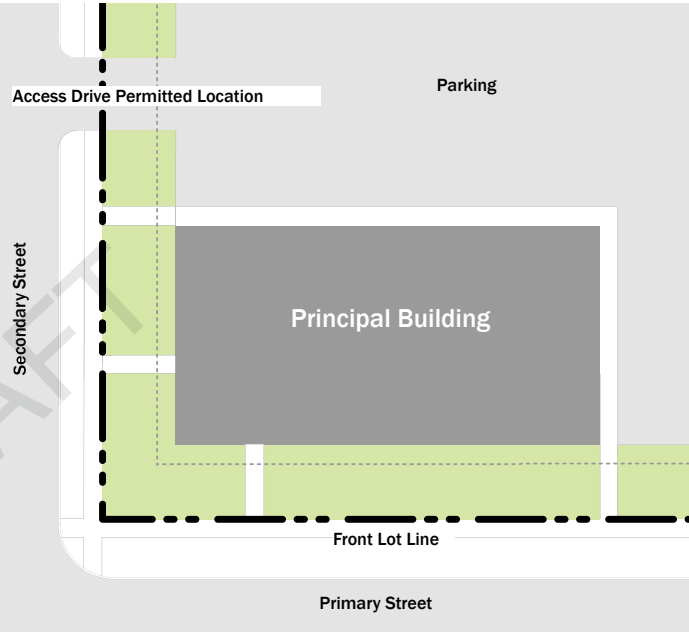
G (2). Secondary Street Frontage: Access Drive Permitted Location
